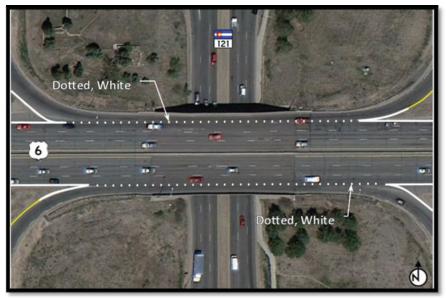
US 6 at Wadsworth Boulevard Proposed Striping
